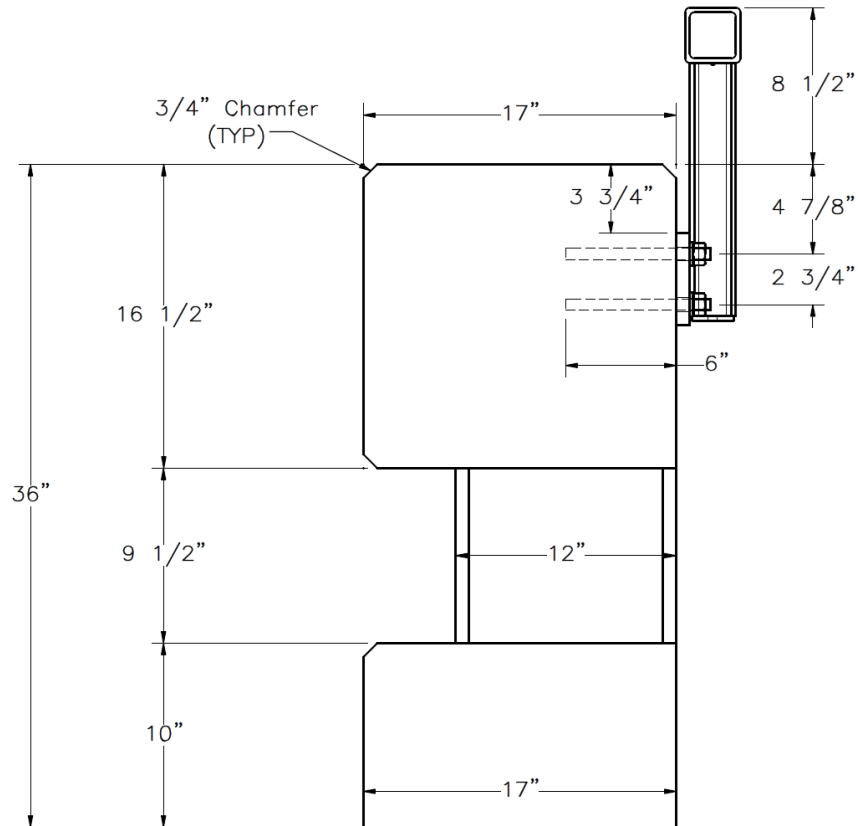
Hawaii Concrete Post and Beam Bridge Rail [7]
